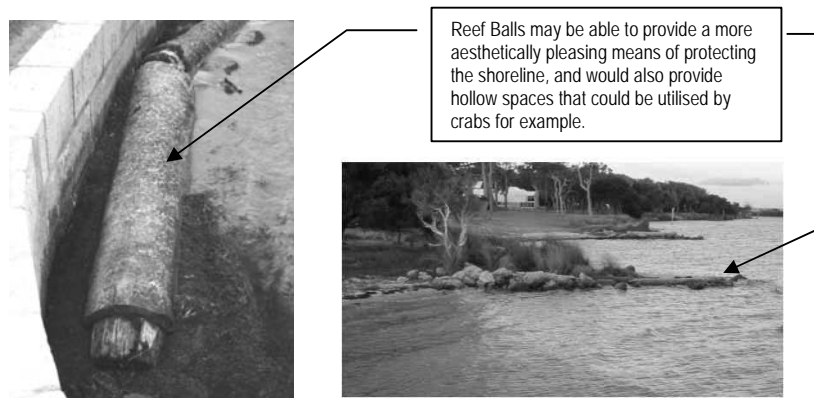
Photos of where Reef Balls could be used for beach protection at Mandurah Quays.
